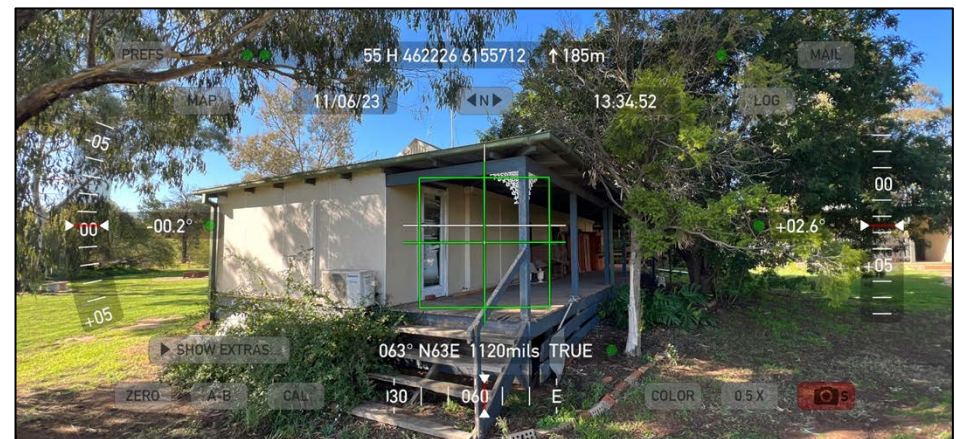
Showing the general condition of the existing residence west elevation and surrounding landscaped gardens.
